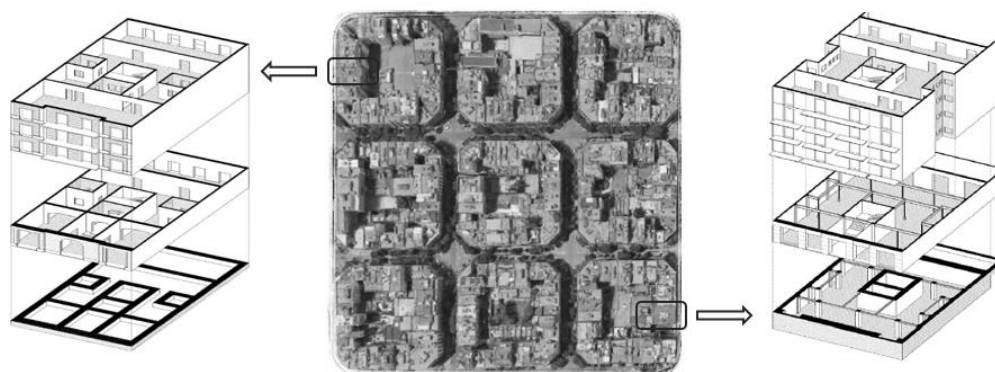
Different structural systems for the rectangular shape buildings in the middle of the typical *Eixample* urban block: homogenous system of continuous slender walls (left) and hybrid system – steel/concrete frames on the ground floor and unreinforced masonry walls on the upper floors (right) (adapted from Paricio Casademunt 2001).
